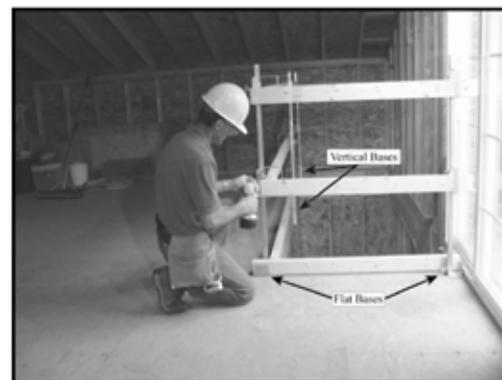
Temporary guarding of the floor opening using flat and vertical bases.
